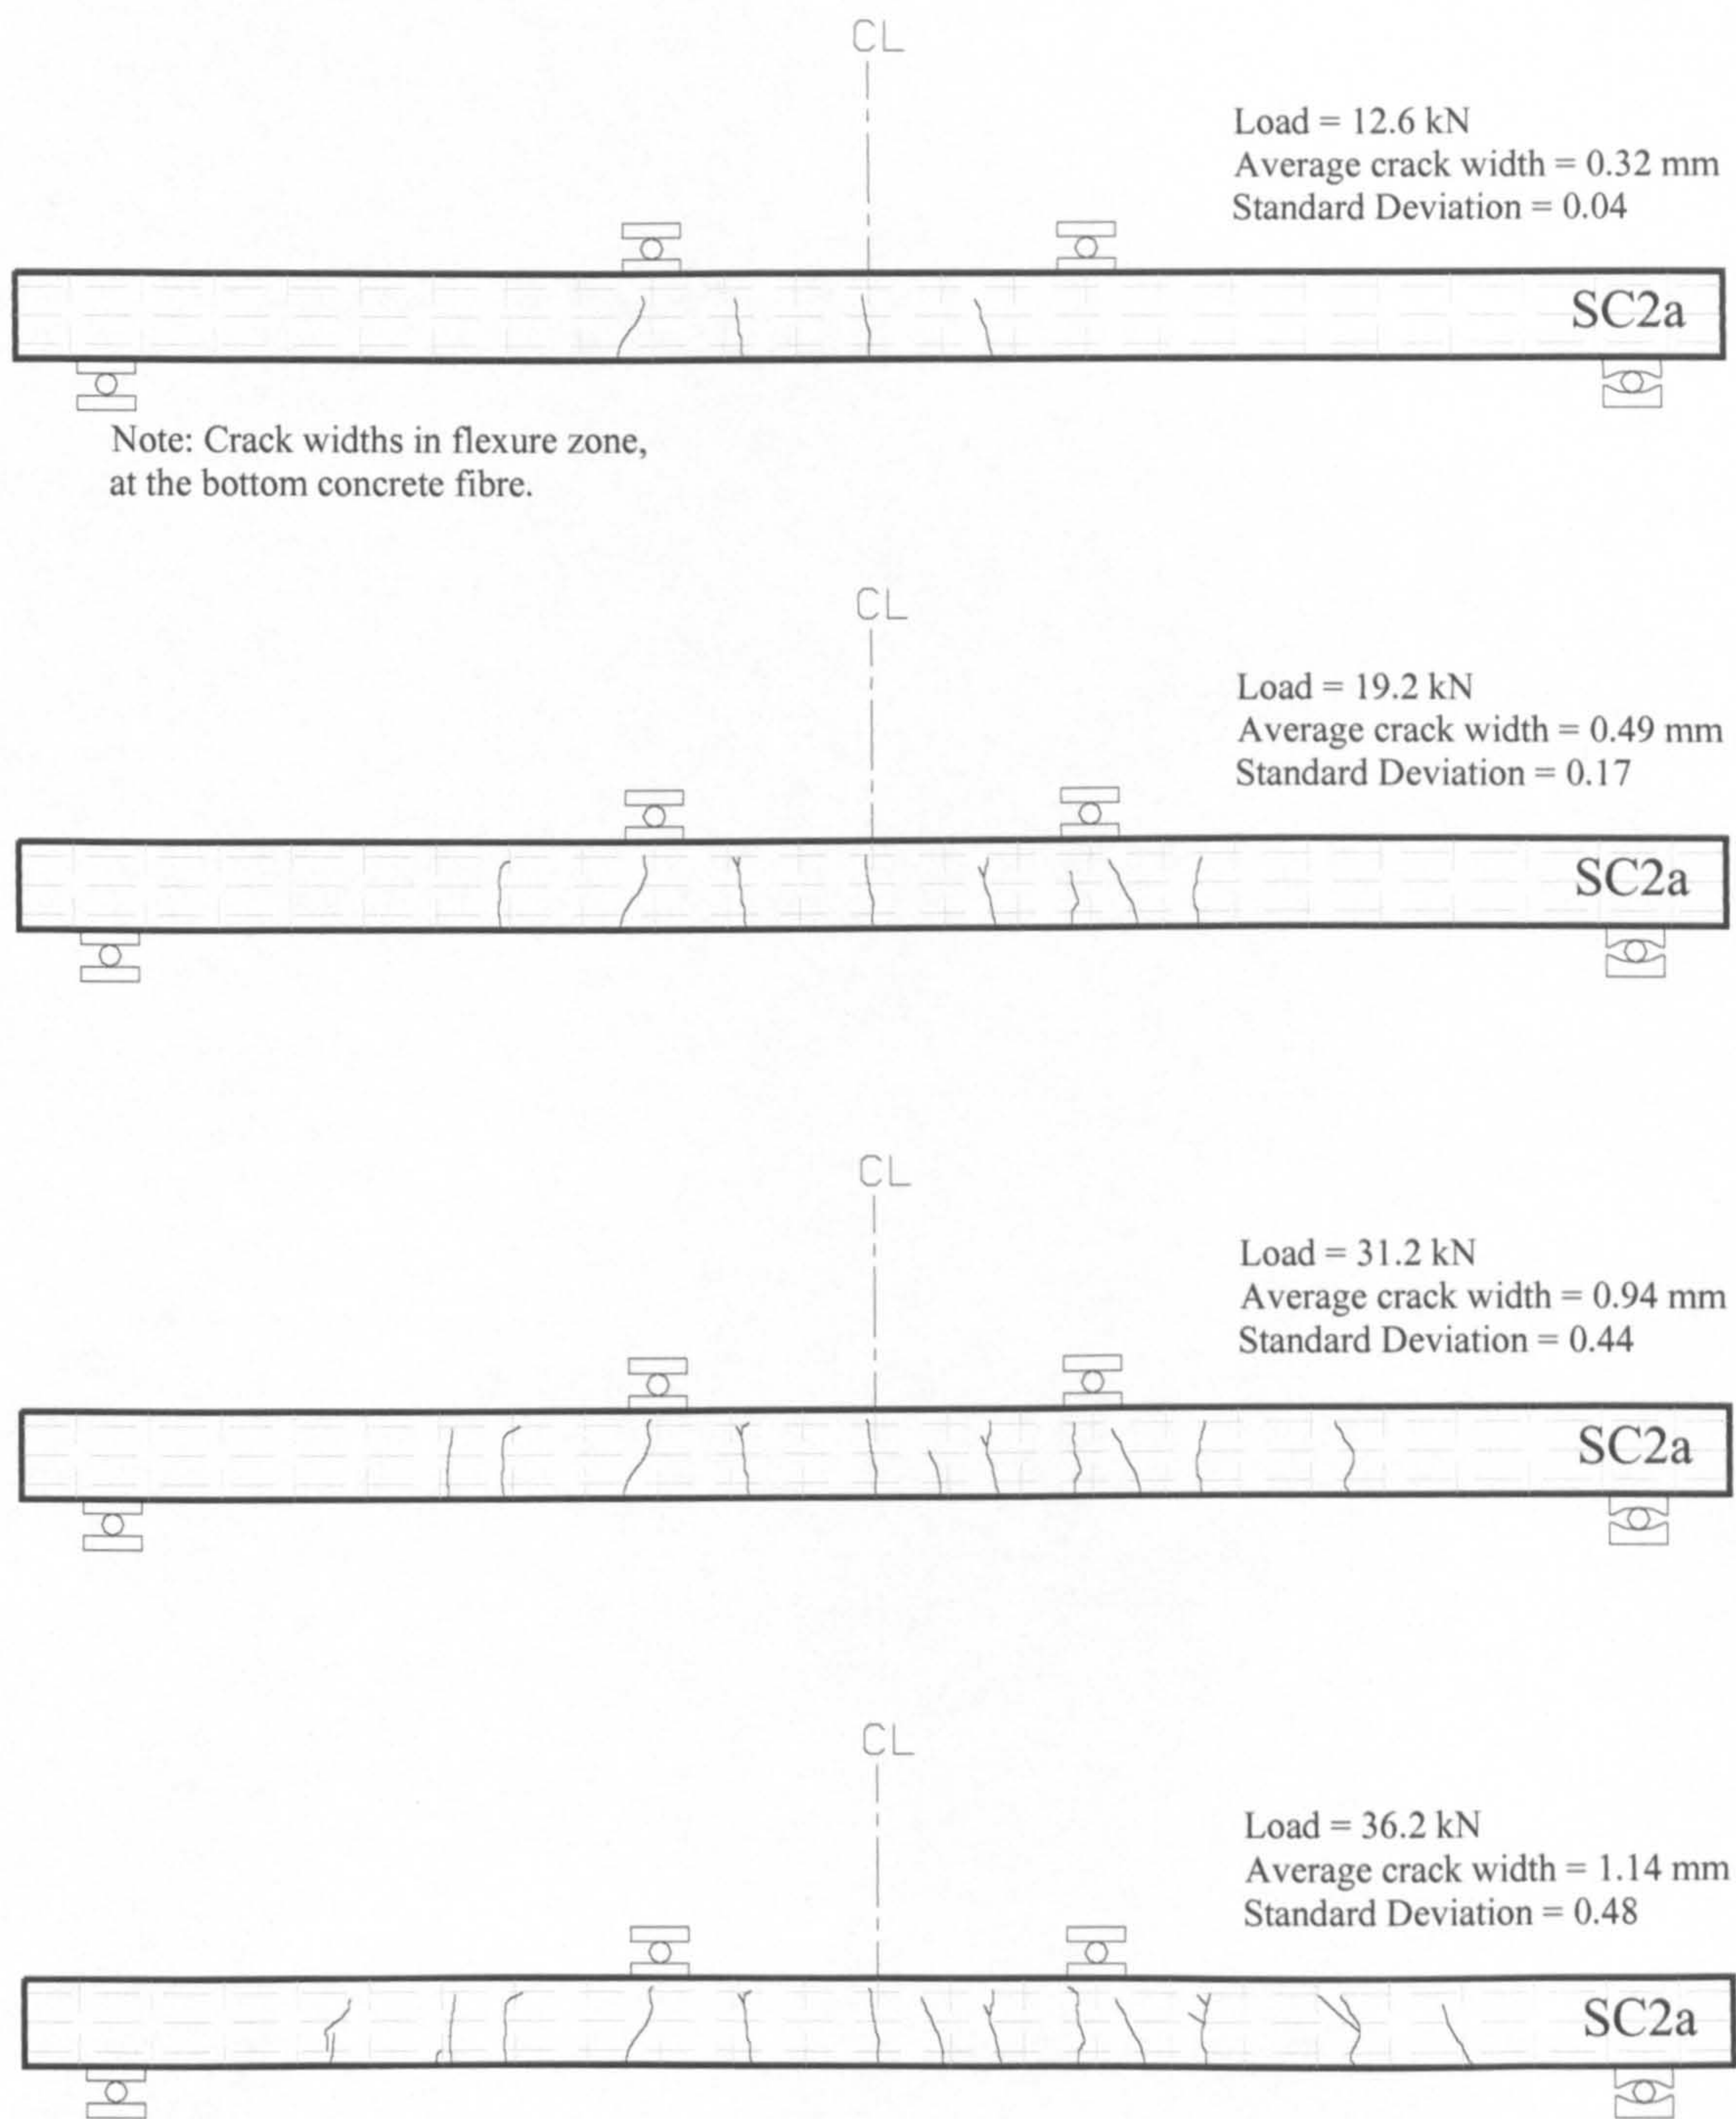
Typical crack patterns and crack width analysis for an FRP slab.
